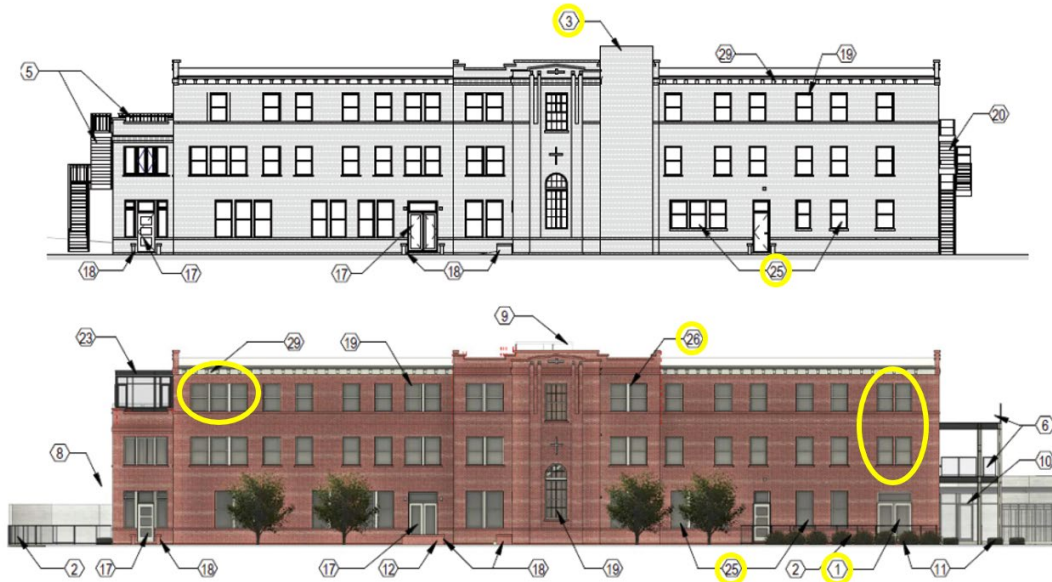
Existing (top) and proposed east elevation (façade) of 2543 4th St. Cropped to show historic portion of building. Numbers noted in narrative highlighted. New window openings indicated by staff.
